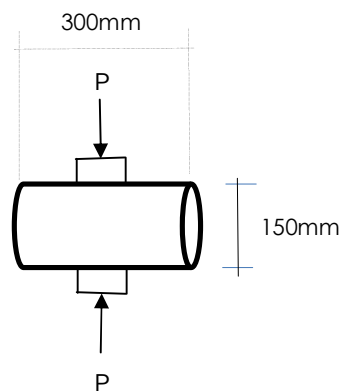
Concrete cylindrical specimen for the splitting tensile strength test.
